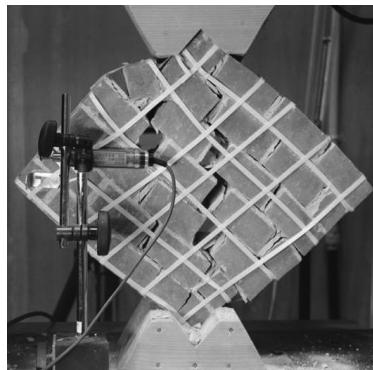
Failure Pattern of PP-band retrofitted masonry wallet
